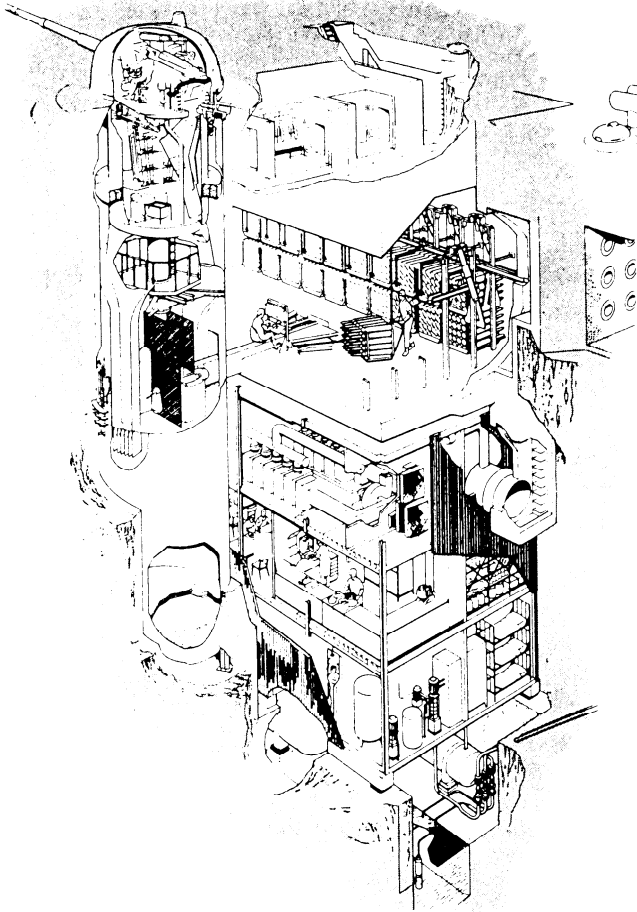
A 120-mm ERSTA turret gun (permission: Royal Swedish Academy of Engineering Sciences).
